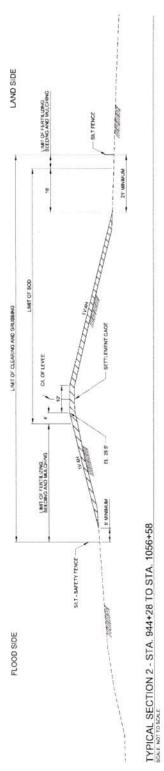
Typical cross-sections for proposed LPV 109 levee lift
